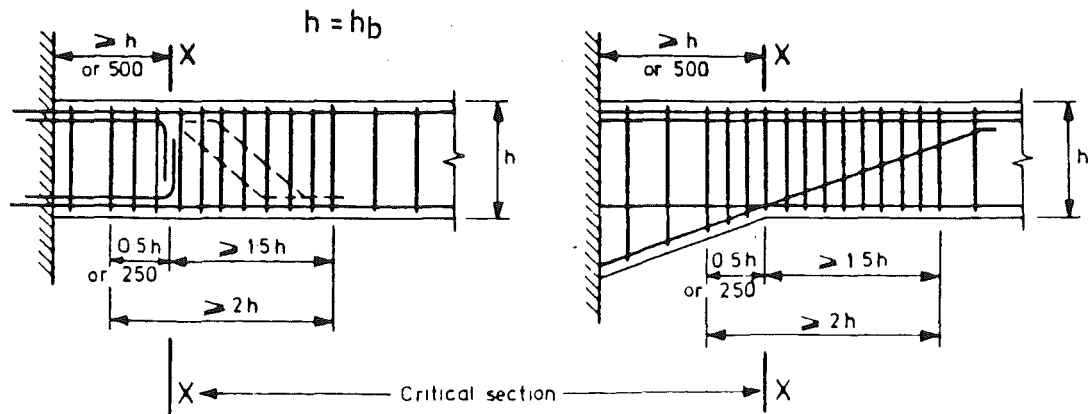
Plastic hinges located in beams away from column faces [4]
